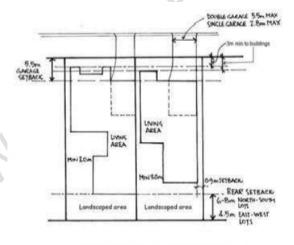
Type A Detached Dwelling - Pemulwuy South - setbacks layout
